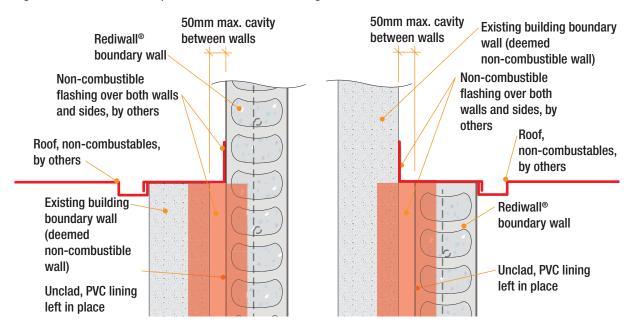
Rediwall® Boundary Wall with Different Wall Heights
